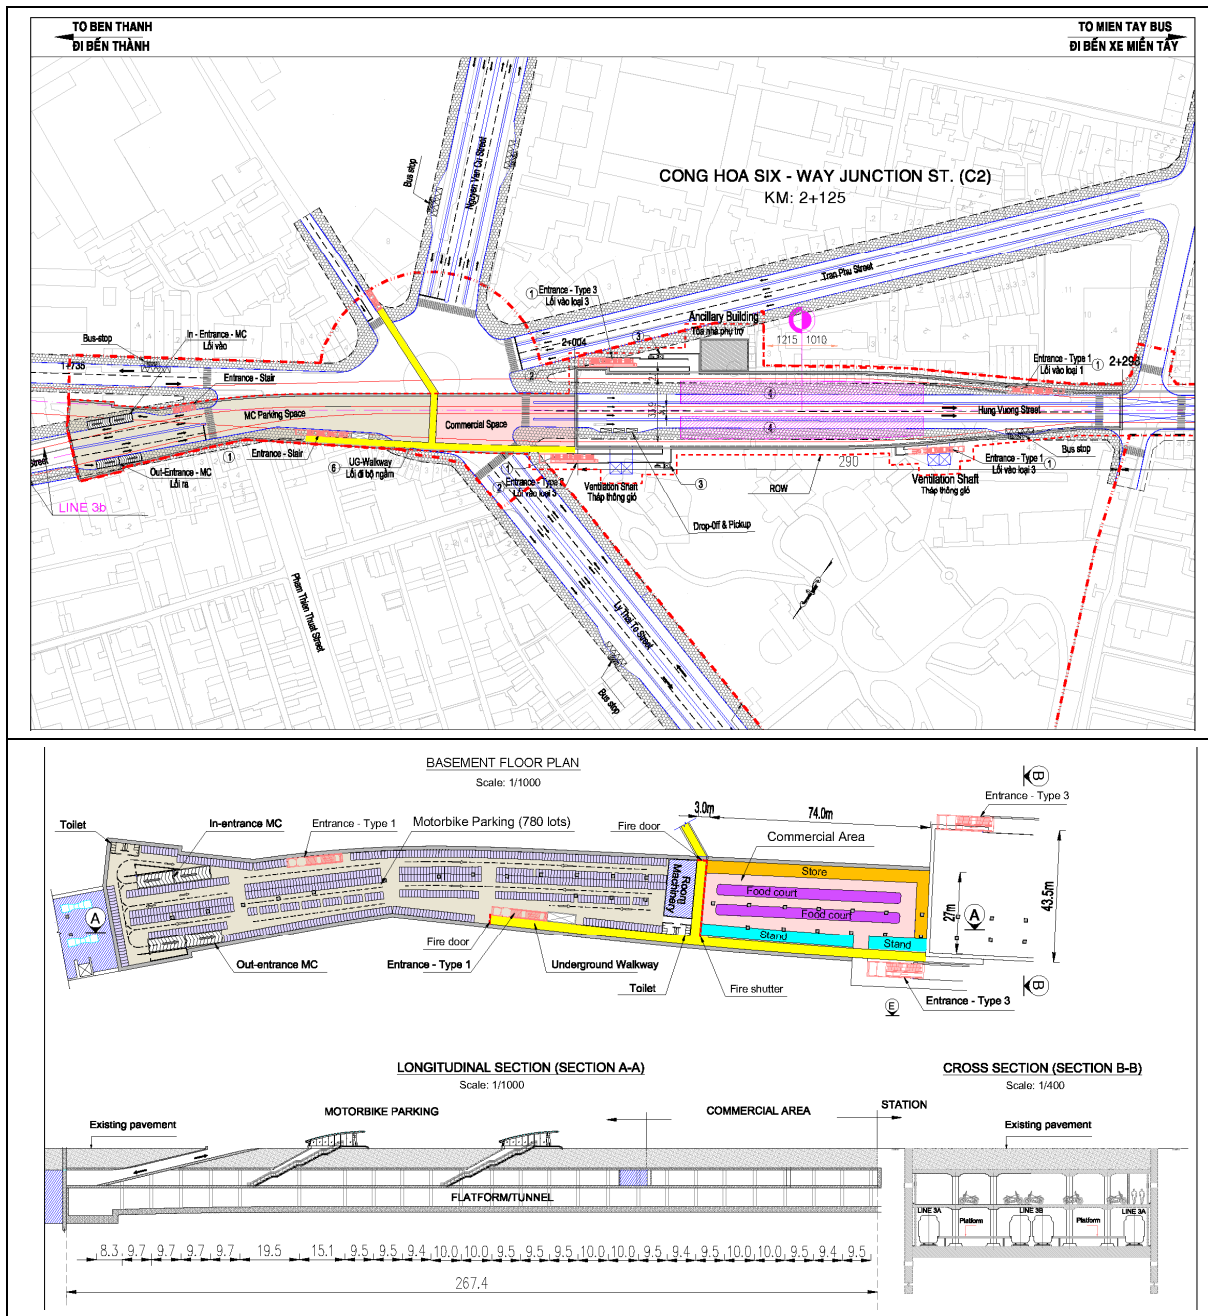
Layout Plan of Underground Parking and Commercial Facilities of Cong Hoa Station
